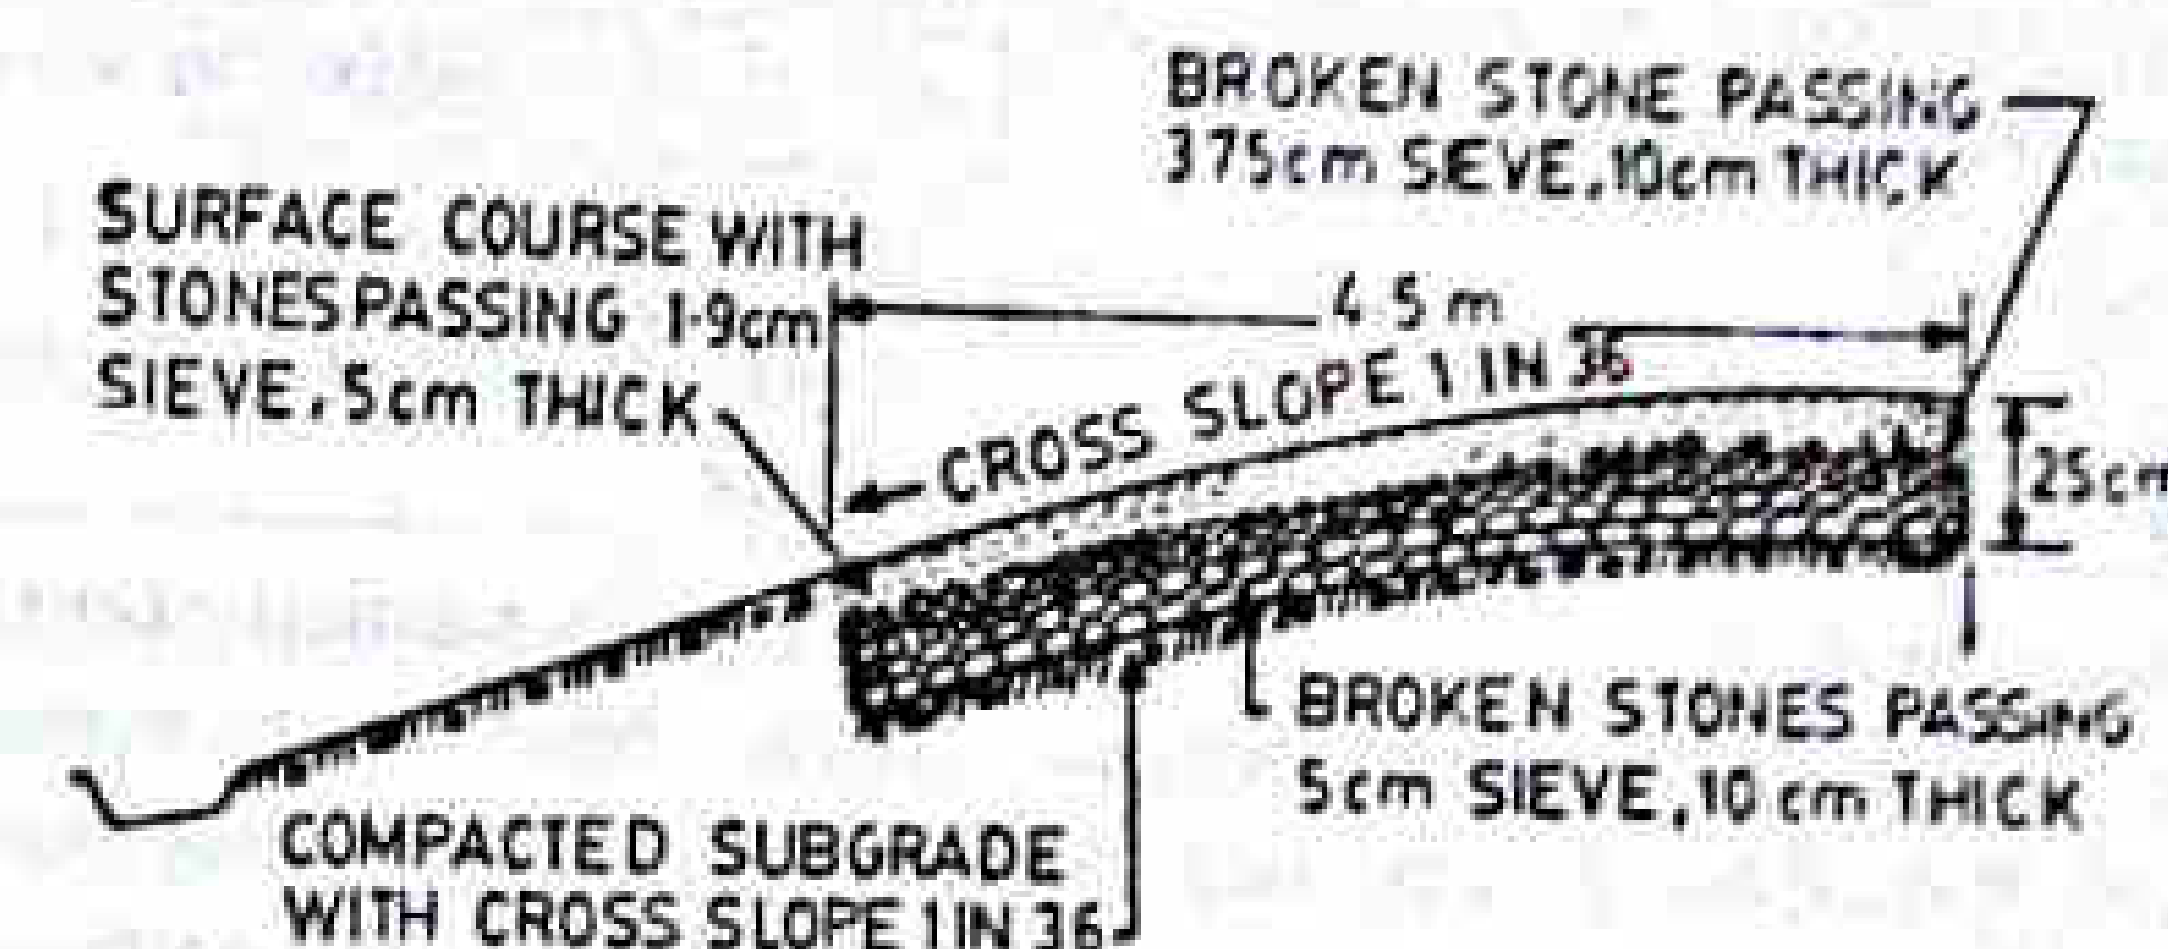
Typical Cross Section of Macadam's Construction (1827 A.D.)
